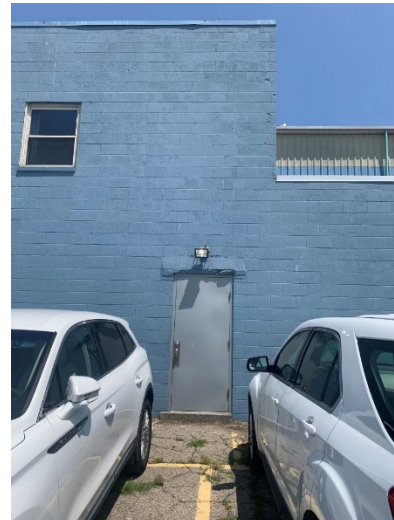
Lintel over the door has failed and will need to be replaced..
